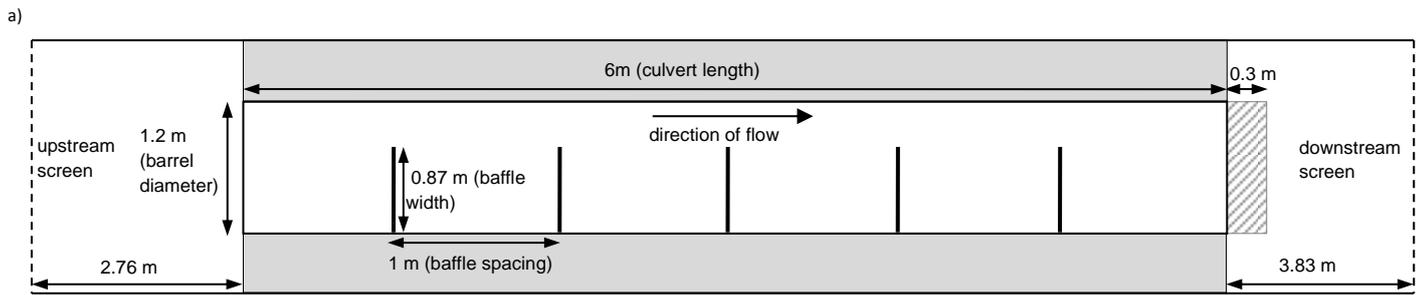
(a) Plan view of the model culvert and test area used to evaluate European eel passage performance. The culvert was installed 38 m downstream from the inlet of a large trapezoidal open channel flume (50 m long, 2.1 m wide at substrate, 0.5 m deep). Three designs were assessed: unmodified (control), or with corner baffles (treatment 1, illustrated) or prototype sloped baffles (treatment 2) installed. The hatched area at the outlet represents the approach zone (protruding 0.3 m downstream of culvert outlet).
